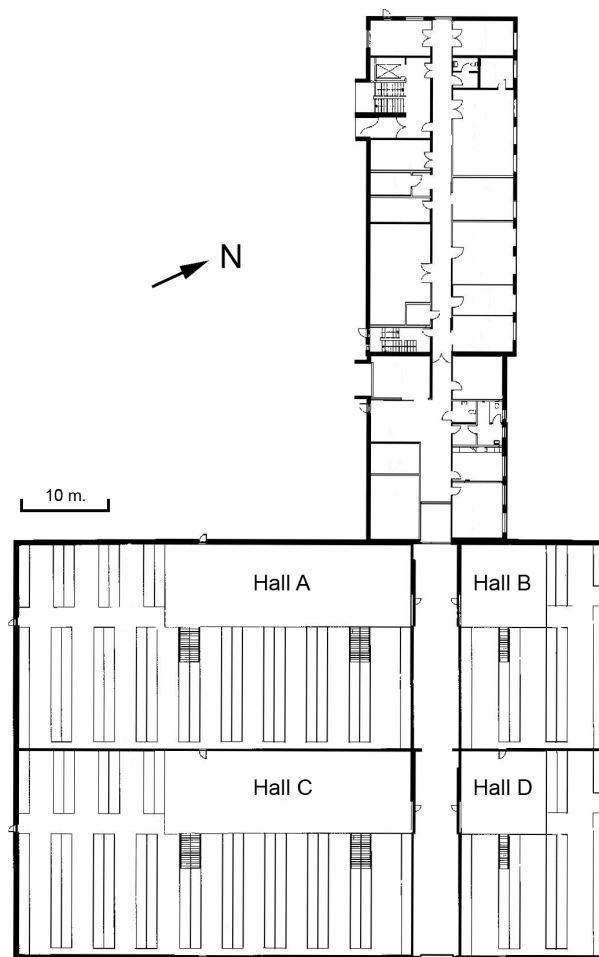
Plan of the Shared storage facilities: The stores (at the bottom) and the Conservation Centre (top). The building connecting the two institutions (middle) contains shared facilities.
